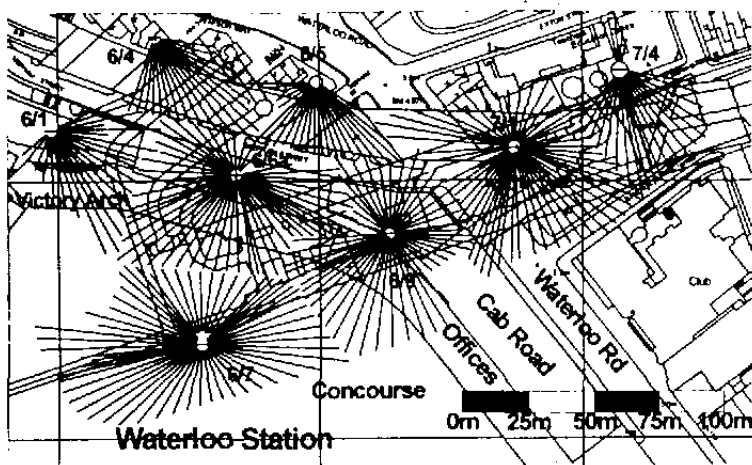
Shaft and grout tube layout for compensation grouting at Waterloo Station (Harris et al, 1996)
